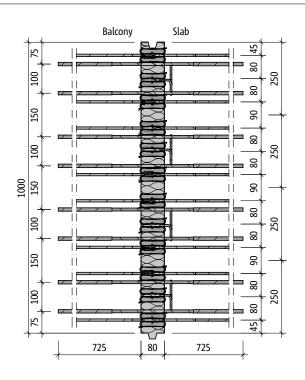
Schöck Isokorb® T type K-E-M6: Product layout Fig. 59: Schöck Isokorb® T type K-T-M10-V1: Product layout
